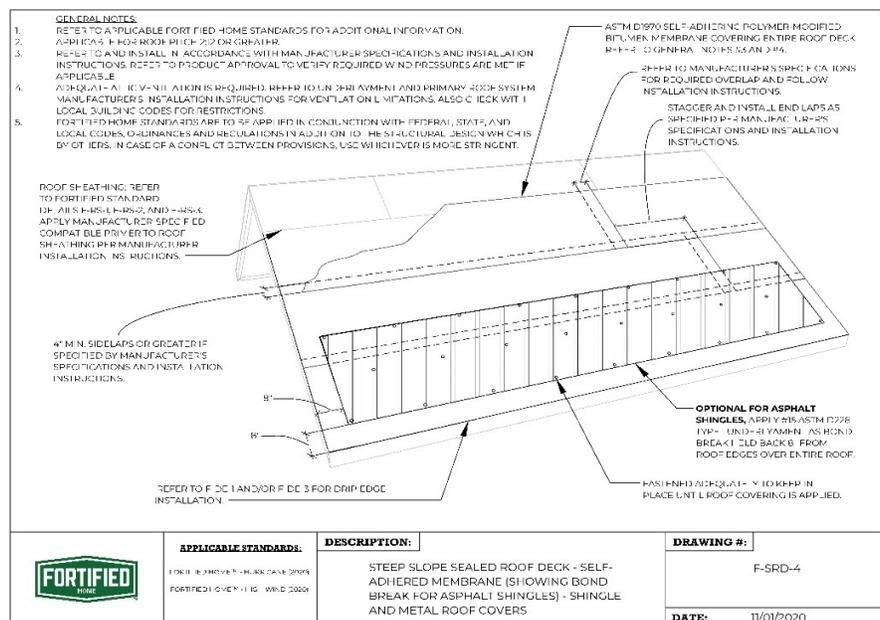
Self-Adhered Membrane SRD Method – FORTIFIED Standard Detail F-SRD-4
